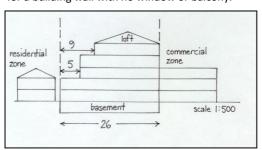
Minimum setback to the primary and secondary street frontages.
